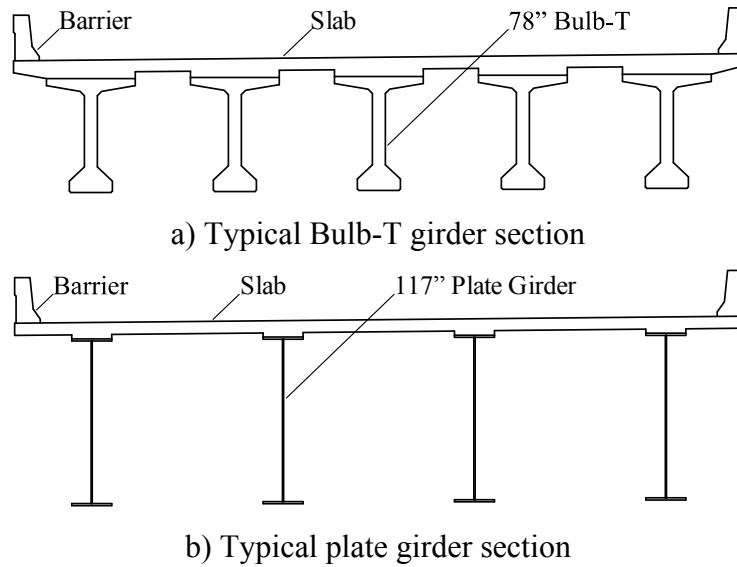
Superstructure cross-sections for the LA-1 Bridge
